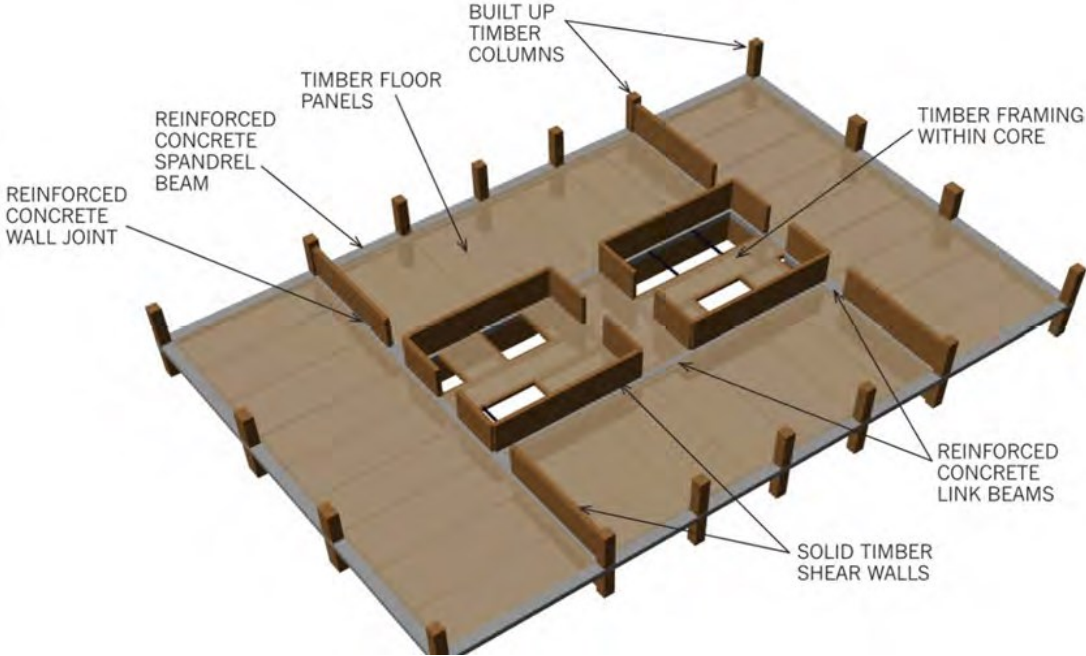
Typical Floor Diagram proposed by SOM (diagram adopted from Baker, 2014)
